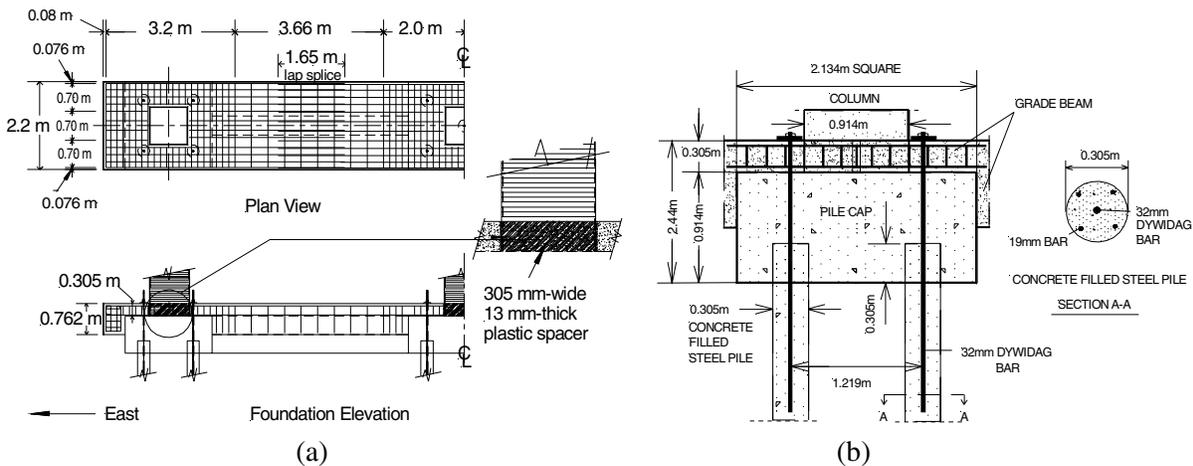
Grade beam retrofit: (a) plan and longitudinal section, (b) grade beam-to-pile connection.
